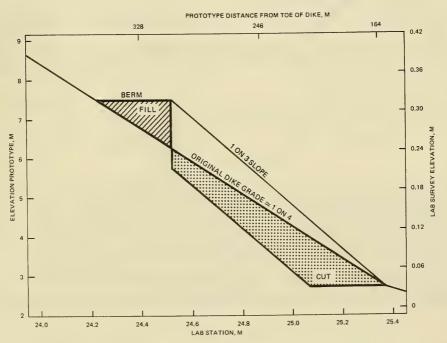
Profile view of cut and fill used to construct a 1 on 3 dike embankment slope for SAJ study
